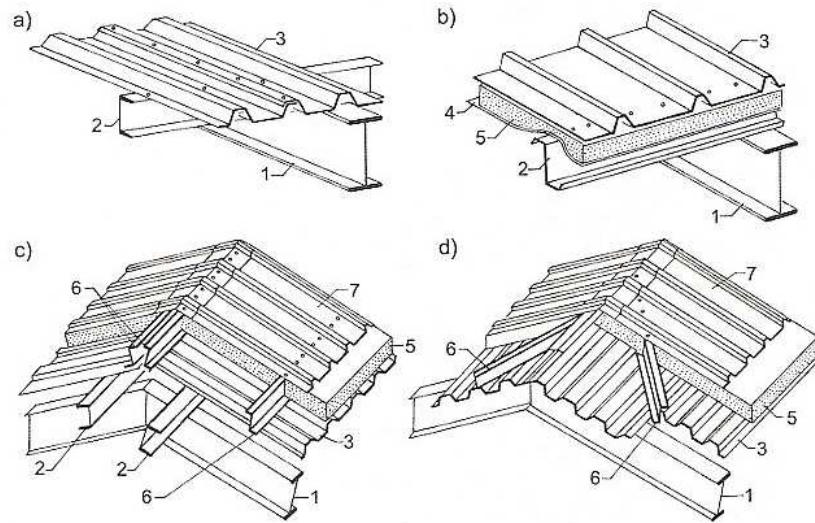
Isometric view of roof covering: 1- rafter, 2- purlin, 3- corrugated sheet, 4- textile, 5- insulation, 6- extra members, 7- external corrugated sheet
